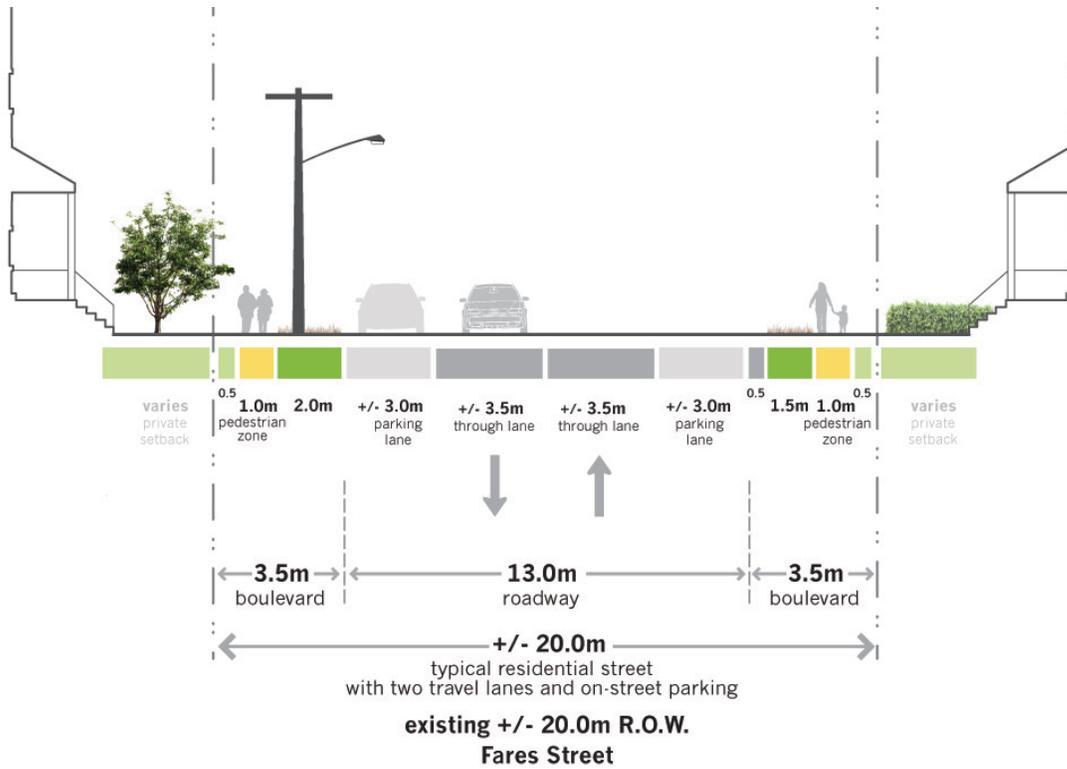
EXISTING AND PROPOSED NEIGHBOURHOOD STREET CROSS SECTIONS
